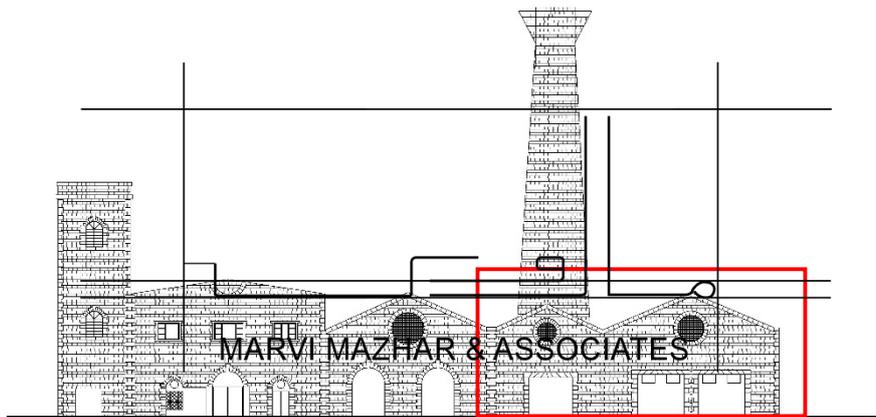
Barrack C and D, South-East Elevation, 15 to 17A Berth, East Wharf, KPT, Karachi.
